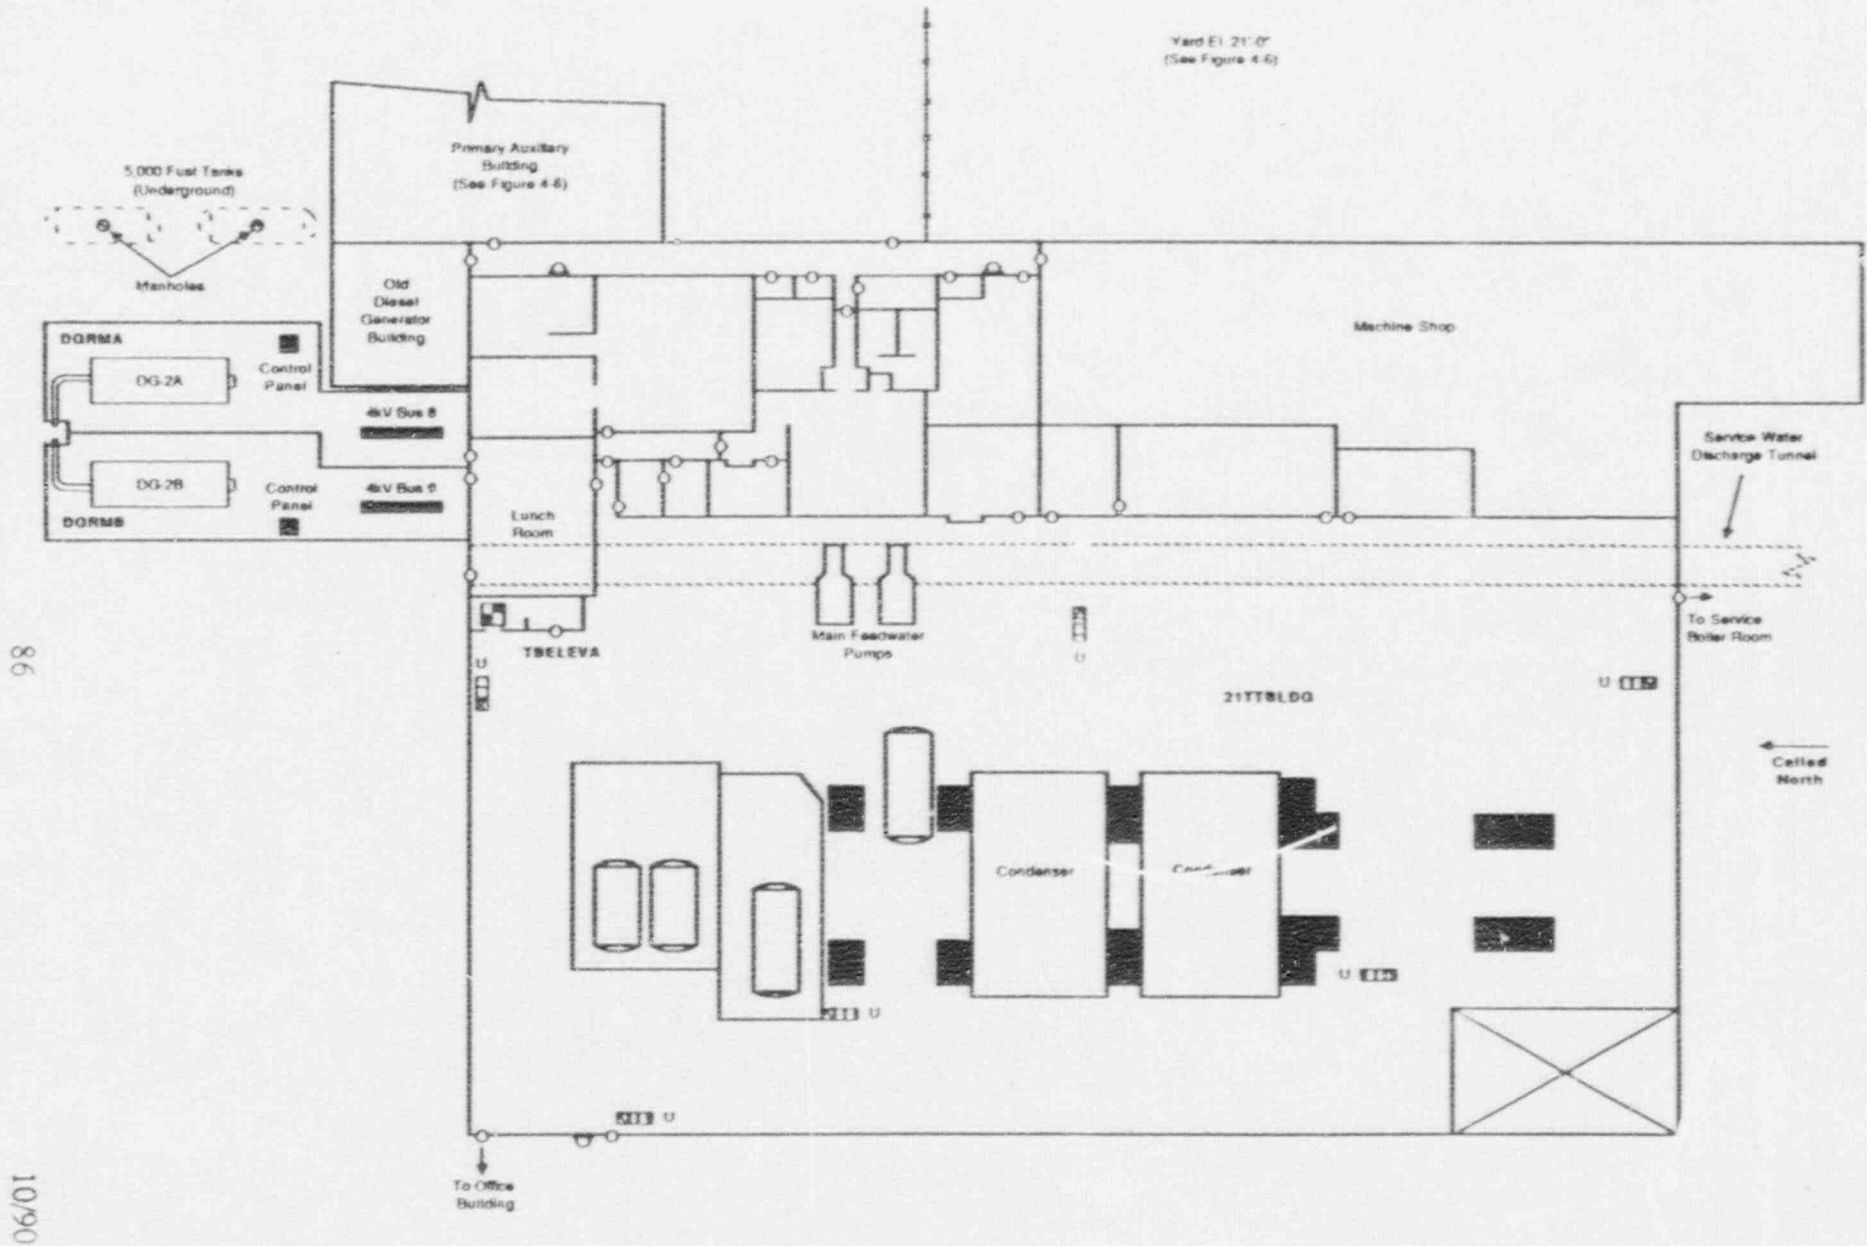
Haddam Neck Turbine Building, Service Building and Diesel Generator Building, Elevation 21'-6"
